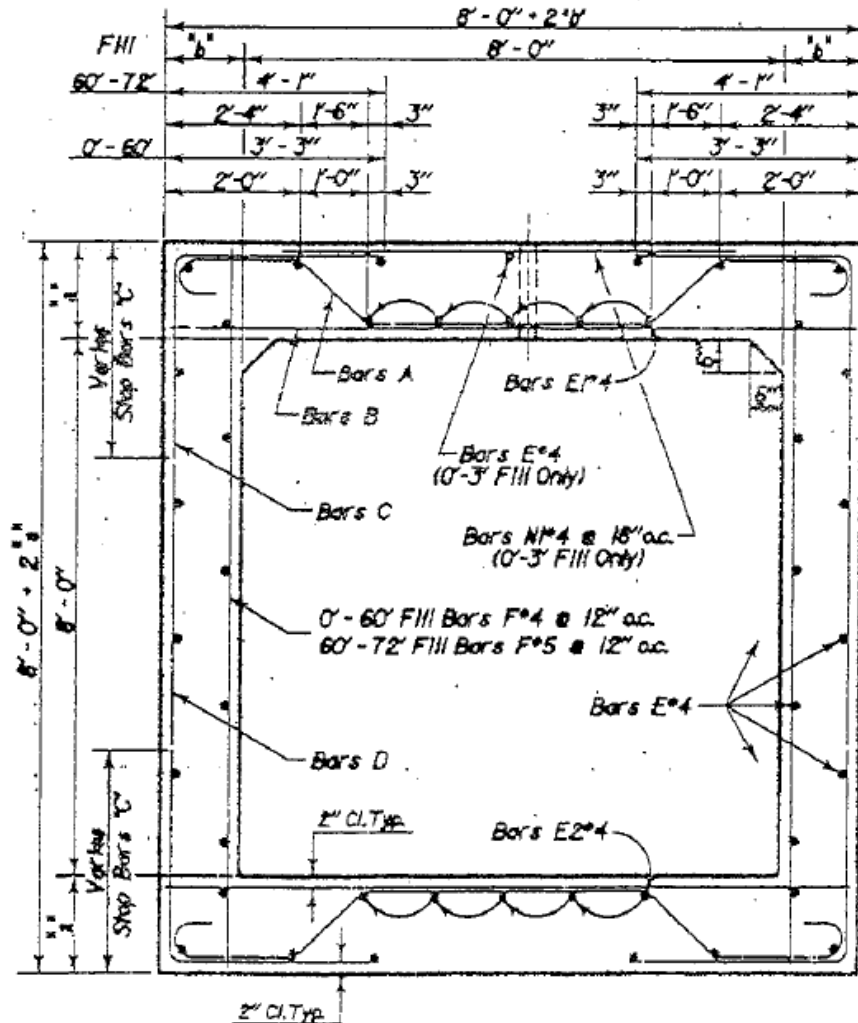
AEB Culvert at 149+60 Cross Section (ALDOT 1986)
